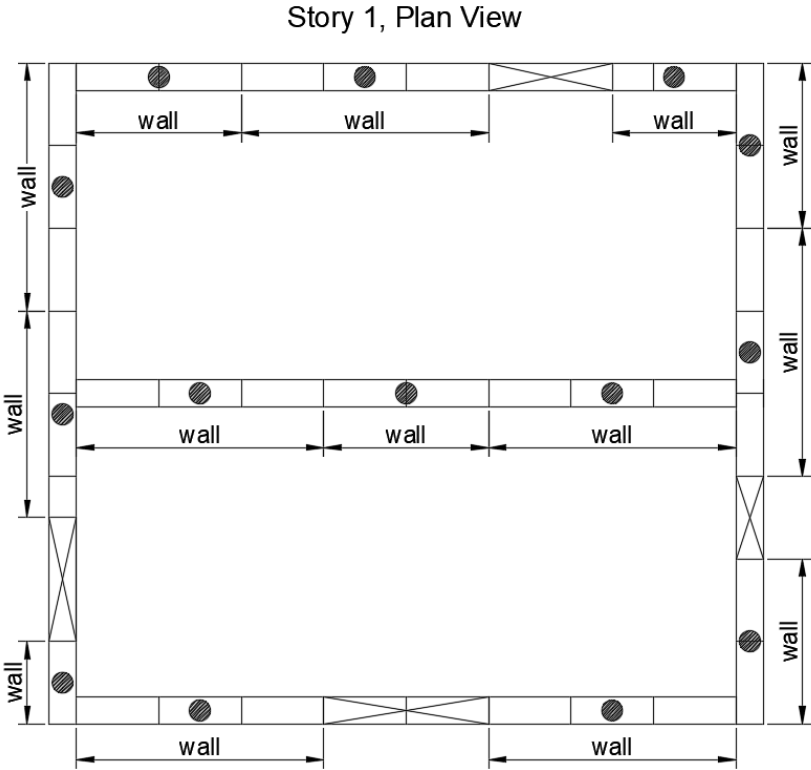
Modeling Details of First Story Walls of the Project Building
